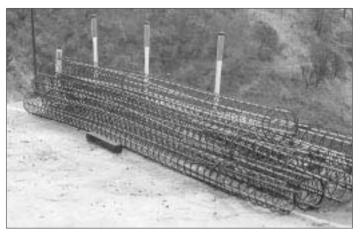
If parts of the site will be inaccessible after pier drilling and wall forming are done, stockpile material, such as stone and rebar cages, beforehand.
